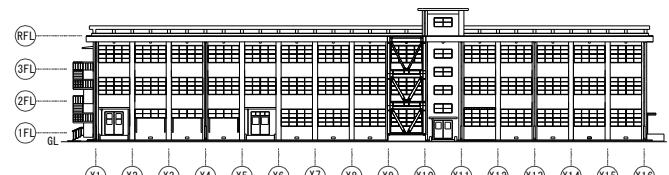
South Elevation of the Building for the Faculty of Architecture and Structural Engineering
